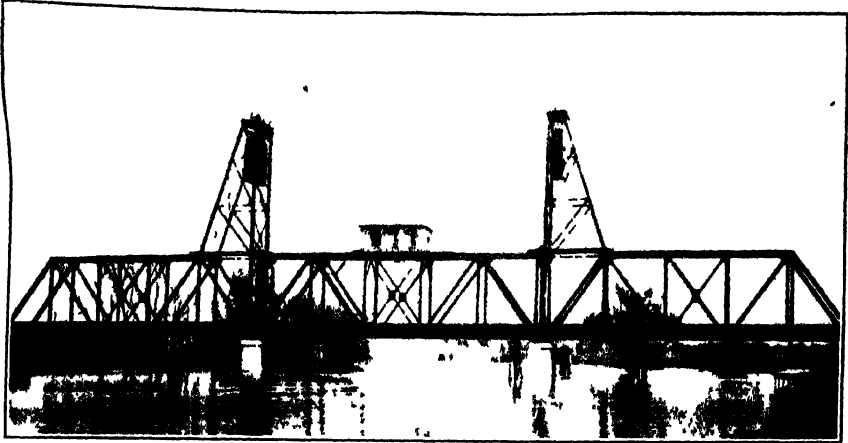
Louisiana & Arkansas Railway Bridge over Little River in Louisiana — Lowering Span Down.
